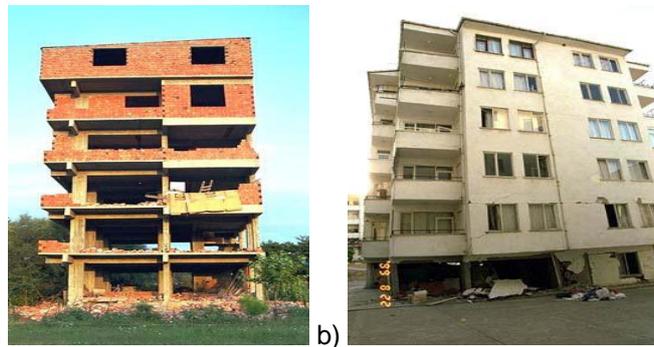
Damage to infill masonry walls in Golcuk (a) and in Degirmendere (b)
